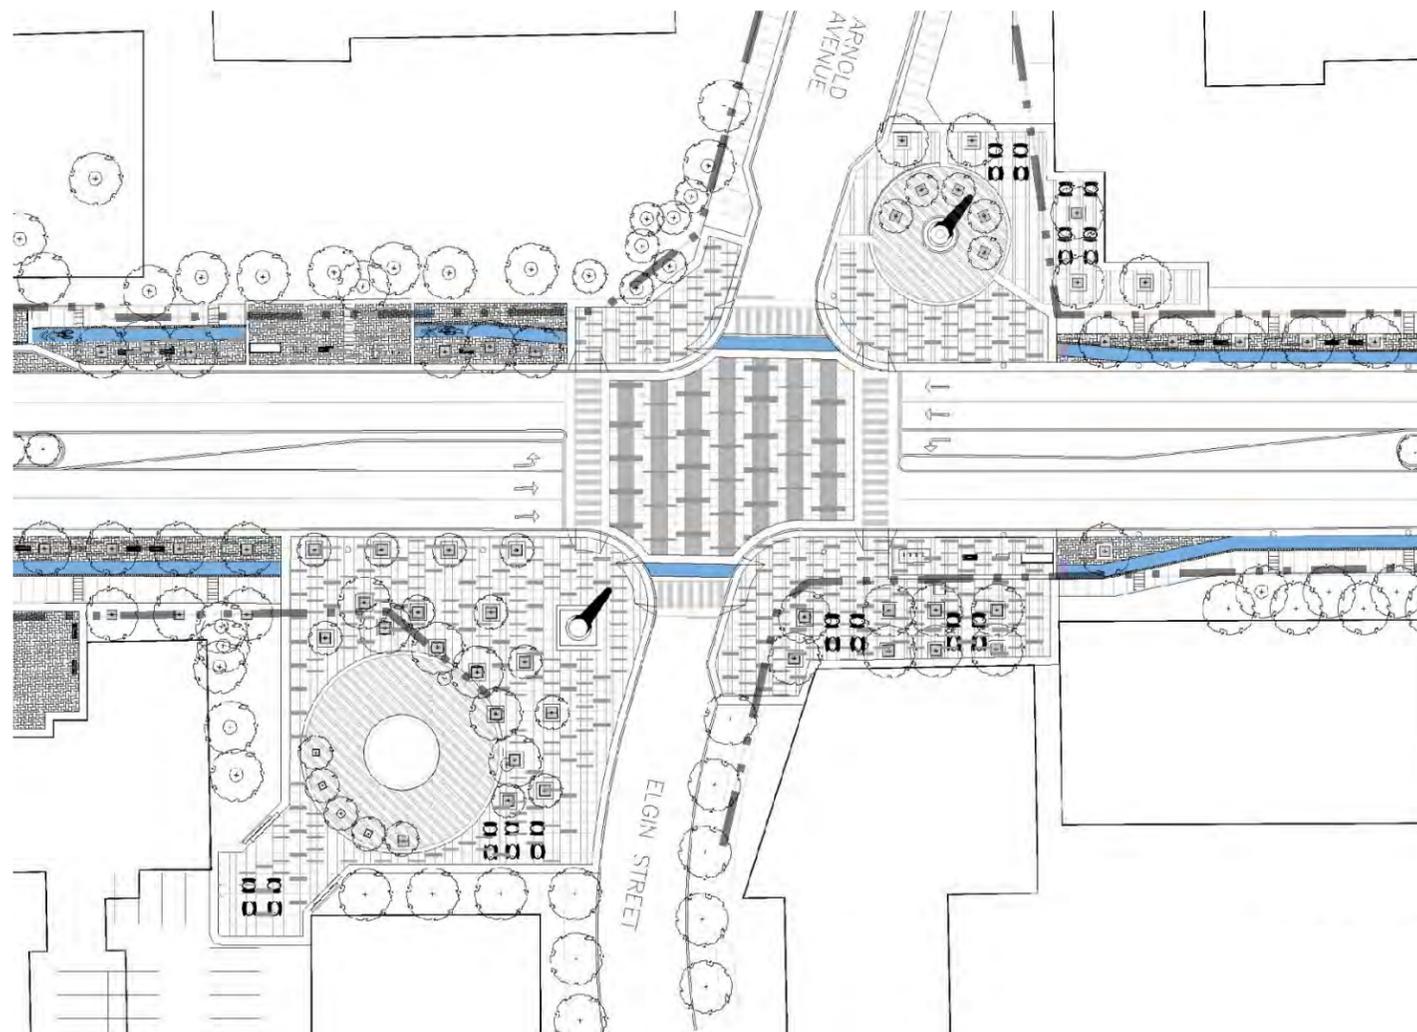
Intersection Detail Area Plan - Old Thornhill District
